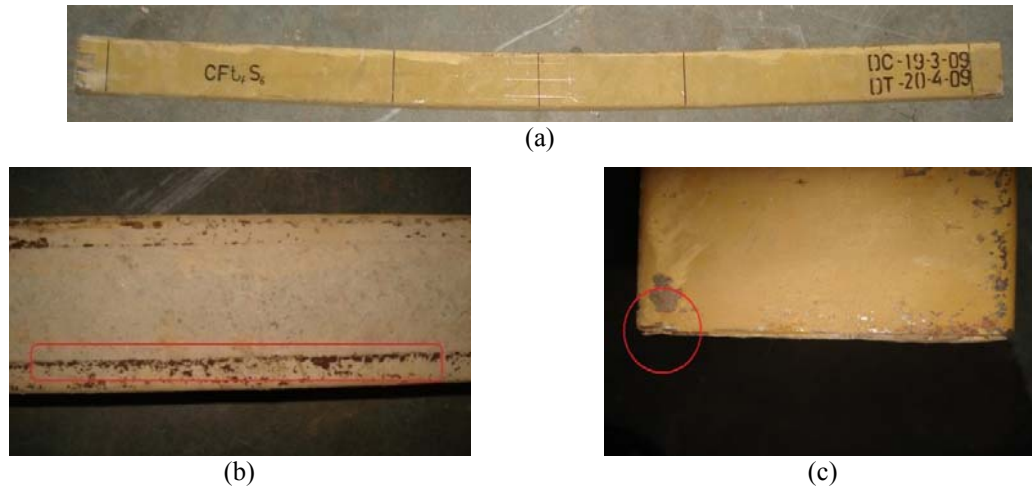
Failure pattern of CFt_fS_6 (a) longitudinal view; (b) separation of concrete from steel ; (c) slip of concrete
